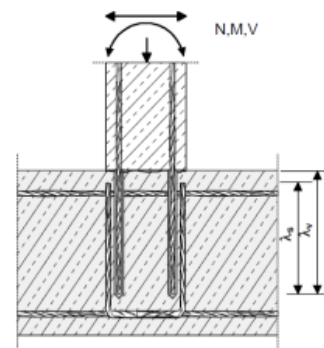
Overlap joint at a foundation of a column or wall where the rebars are stressed in tension
